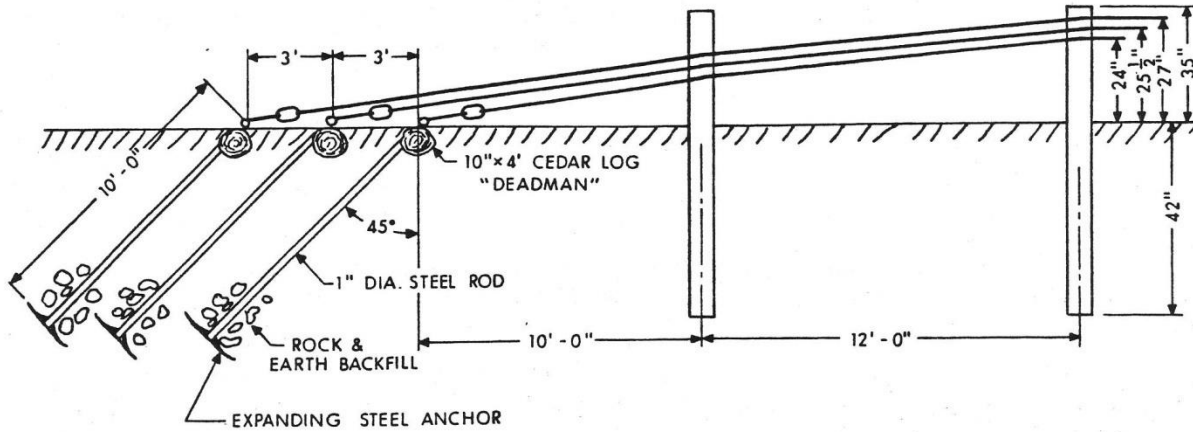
Canadian Department of Highways "Expanding Steel" Anchor Details, 1967 [19]
